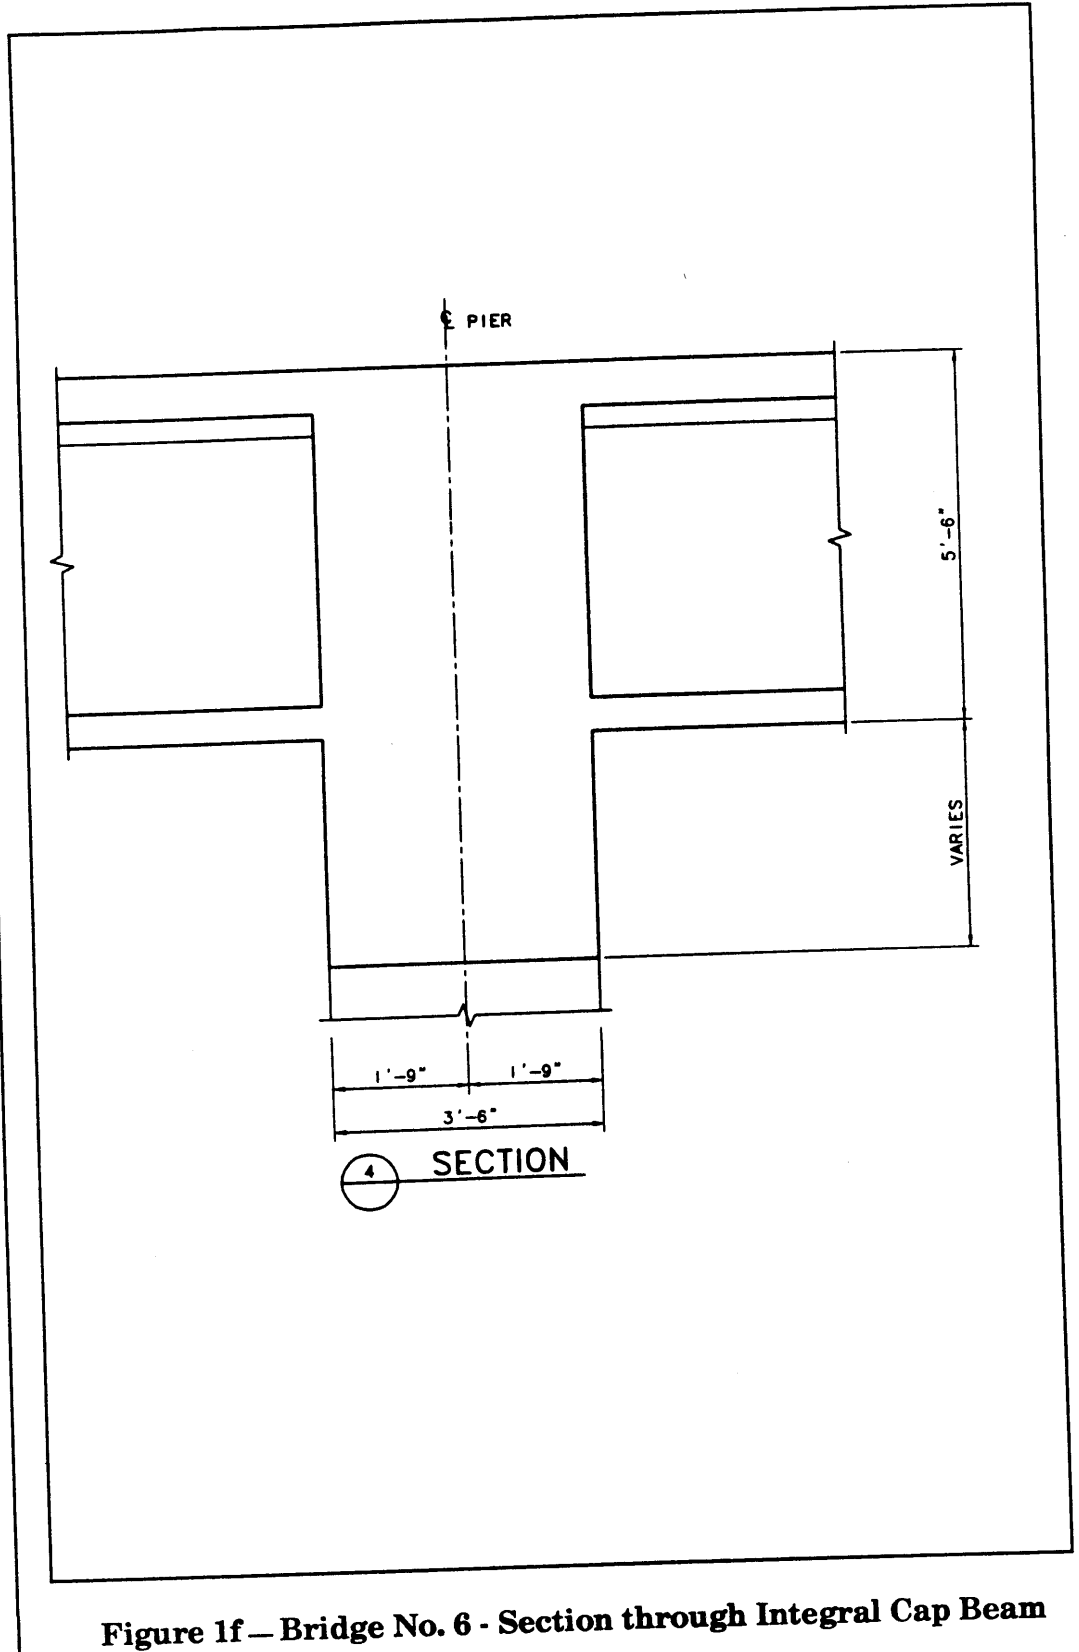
Bridge No. 6 - Section through Integral Cap Beam
